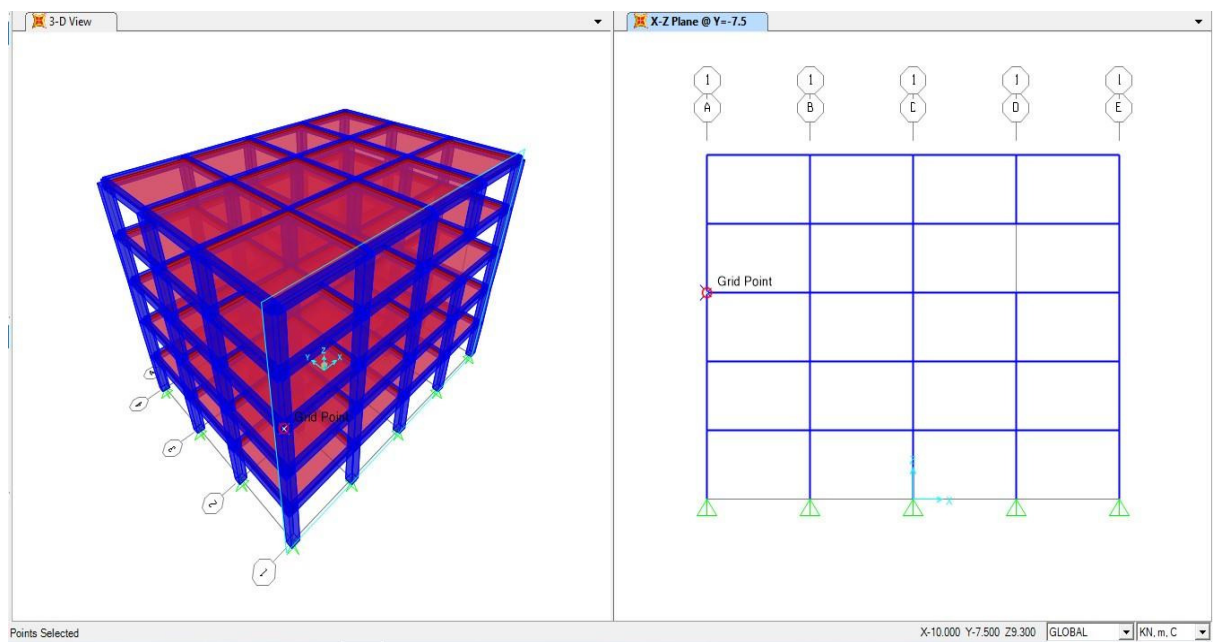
Extruded 3D view of model showing floating column at 3rd floor
